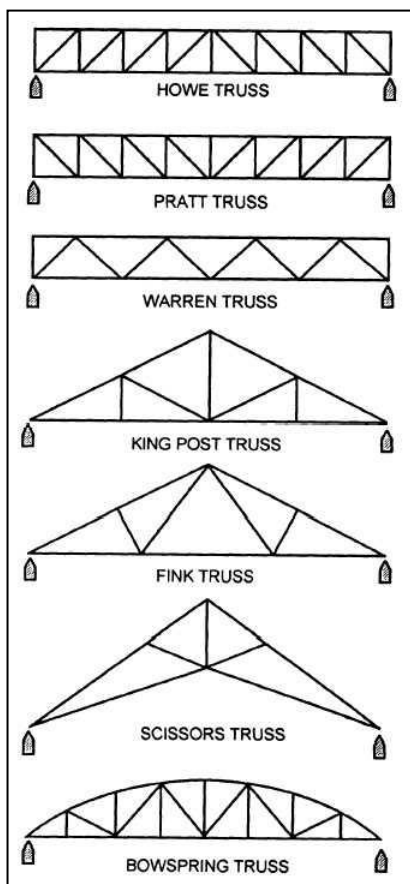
Common Roof Truss Systems (Integrated Publishing, 2010)
